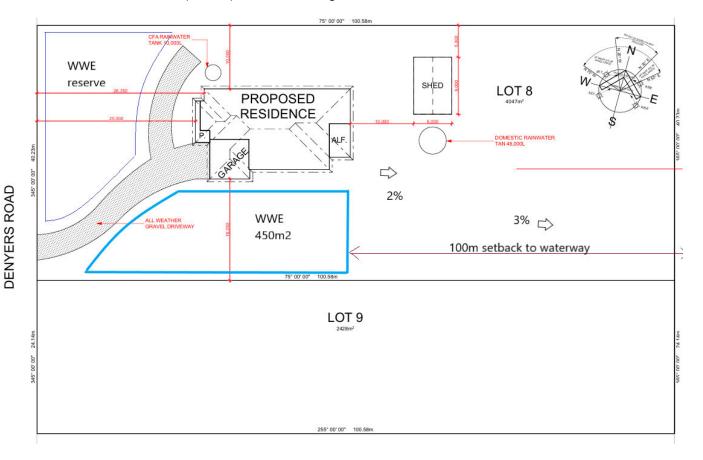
Location of proposed building envelope and waste water envelope for use of primary treatment (450m²) with setting, setbacks and slope direction. WWE (reserve) shown to west of residence.
